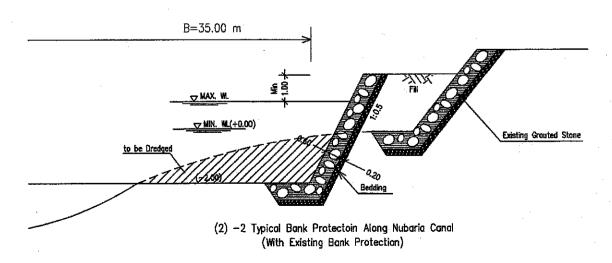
Typical Sections of Dredging and Bank Protection
